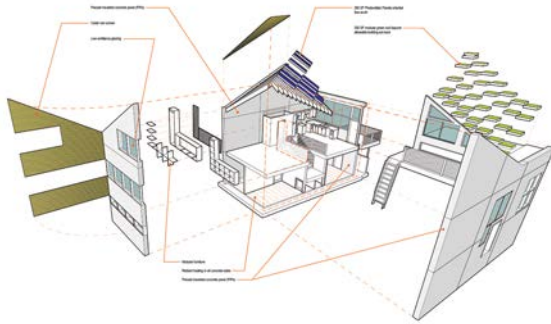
Exploded drawings showing final components including insulated precast concrete panels, Photovoltaic Array, and Modular Green Roof; PRETTYFAB.
